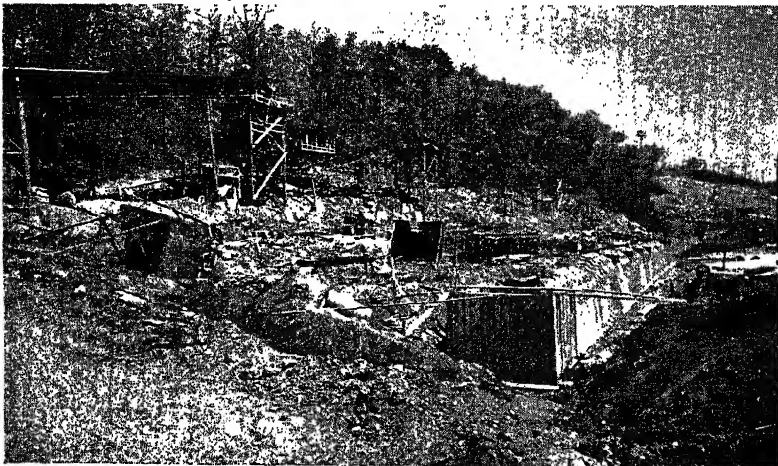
Aggregate reclaiming tunnel under construction.
